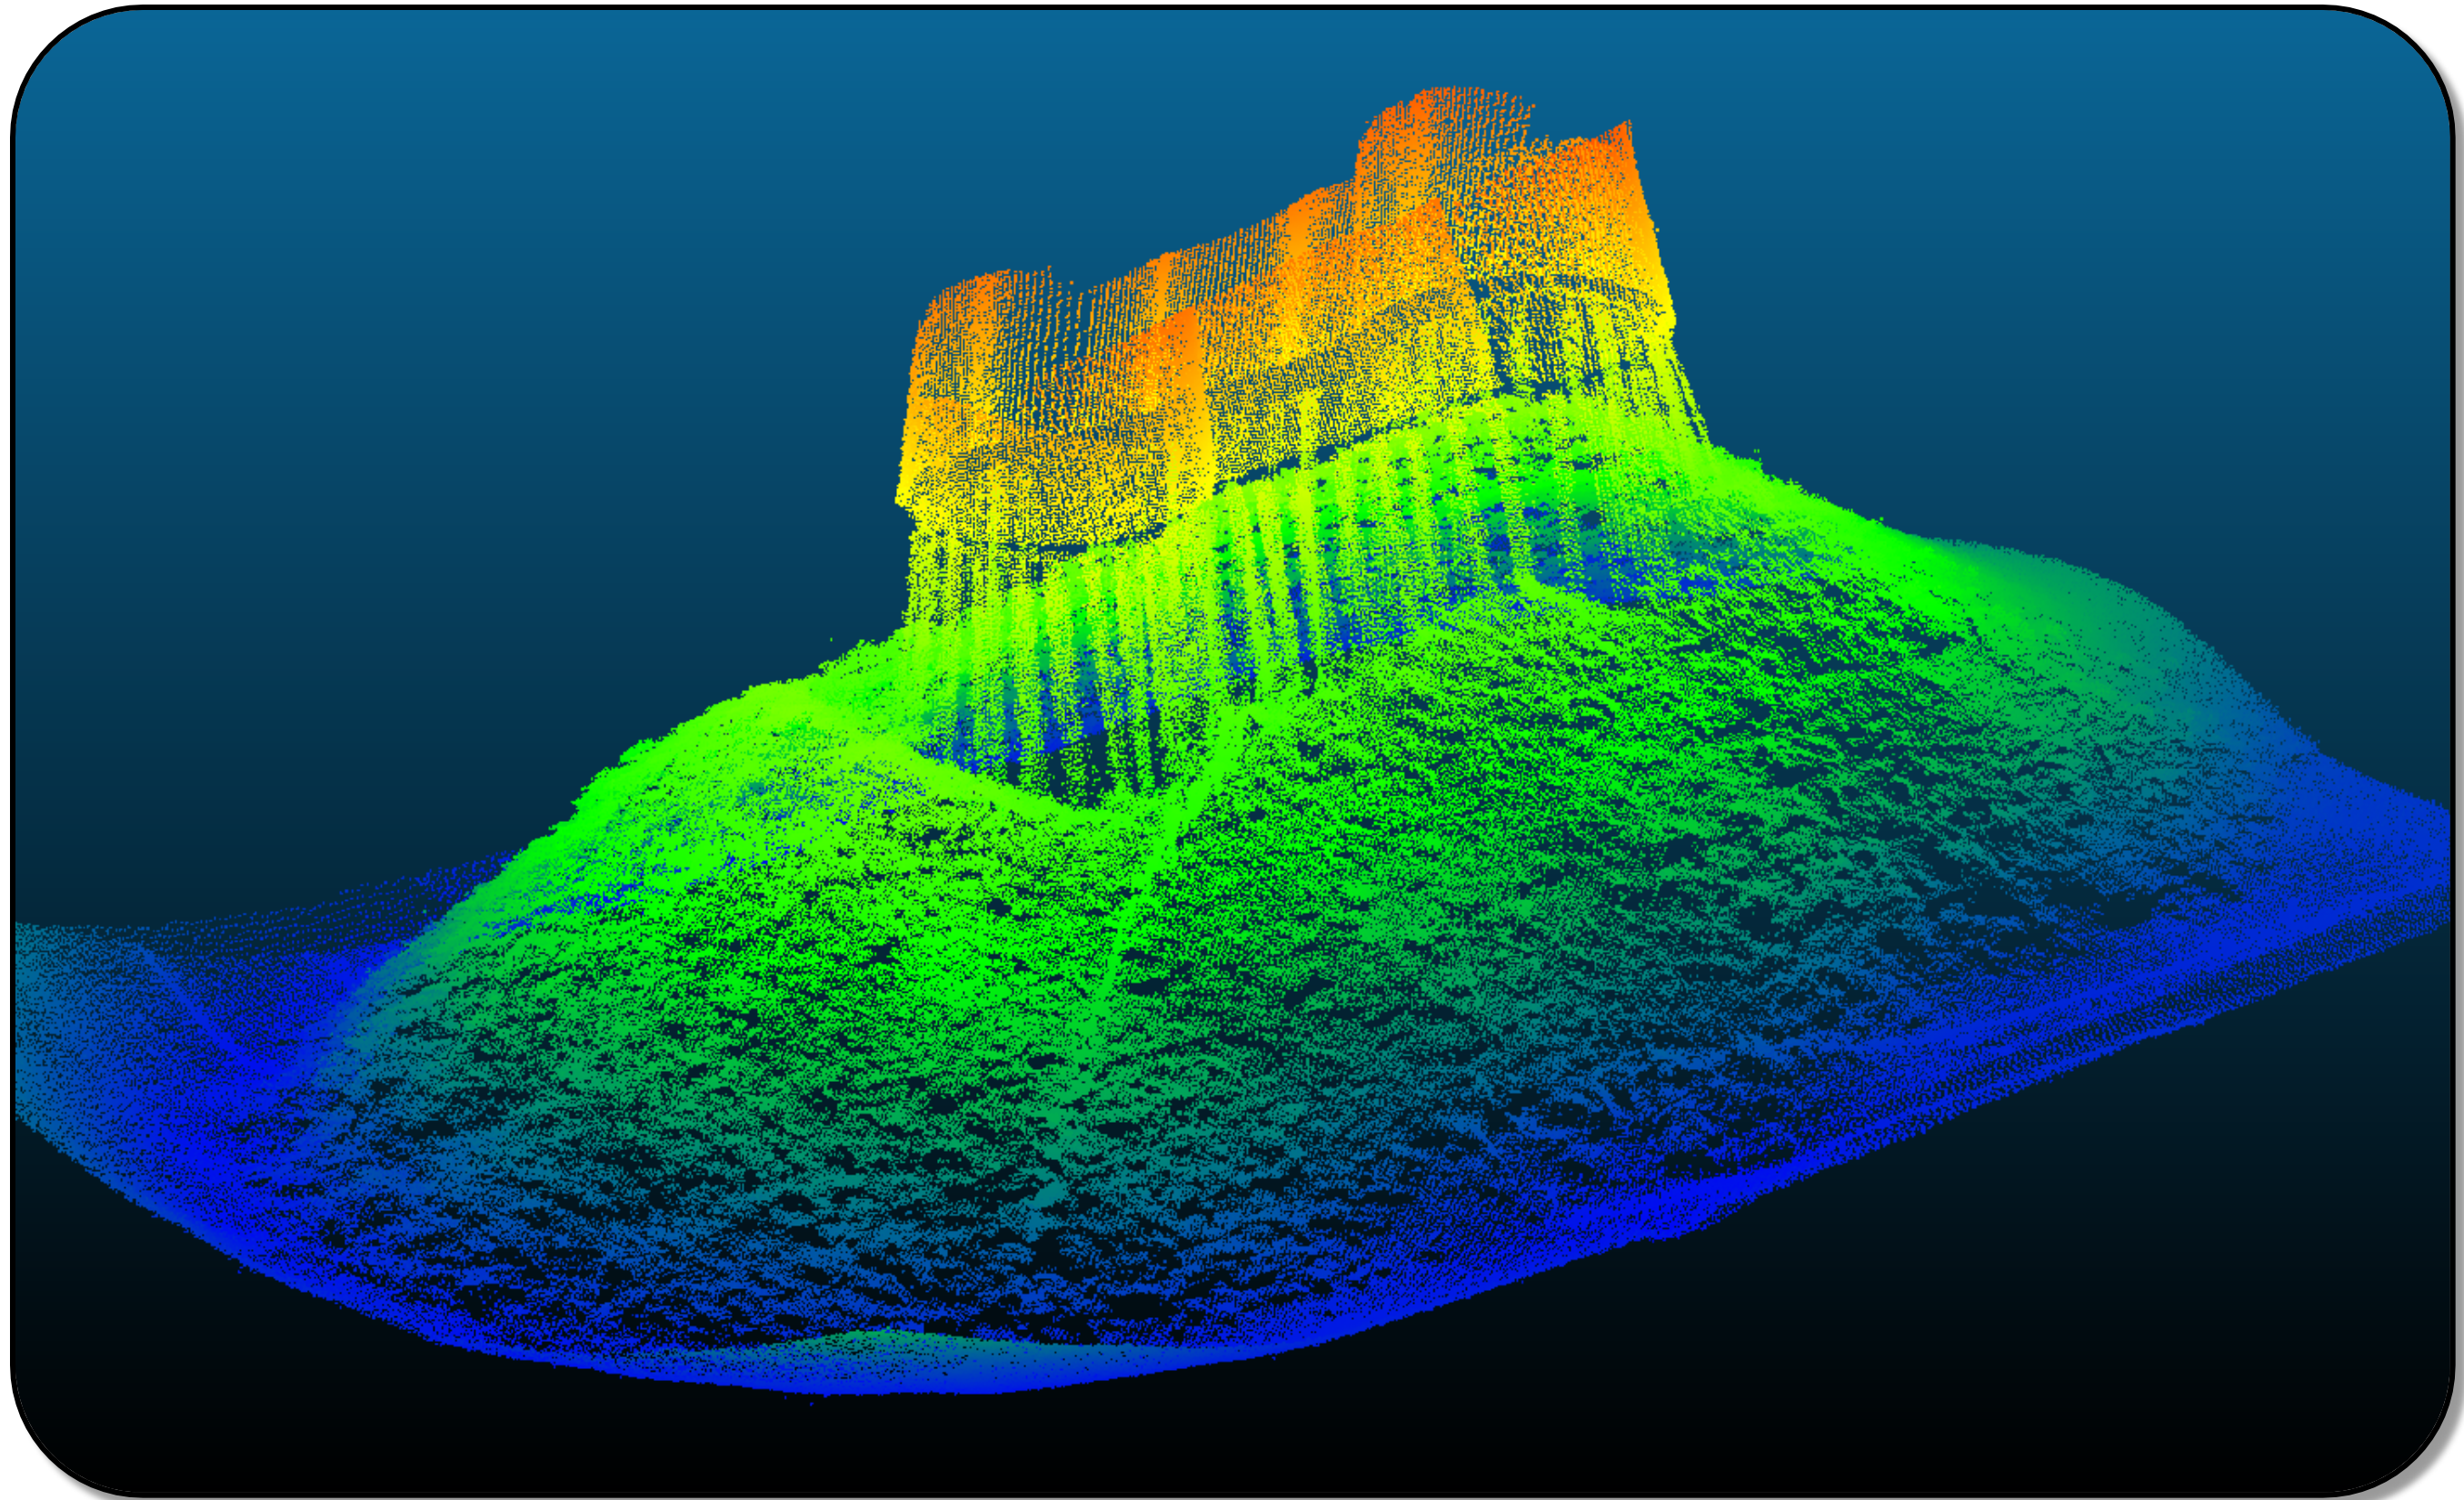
Perspective view of Pier 12 point cloud (looking from the northeast direction).
